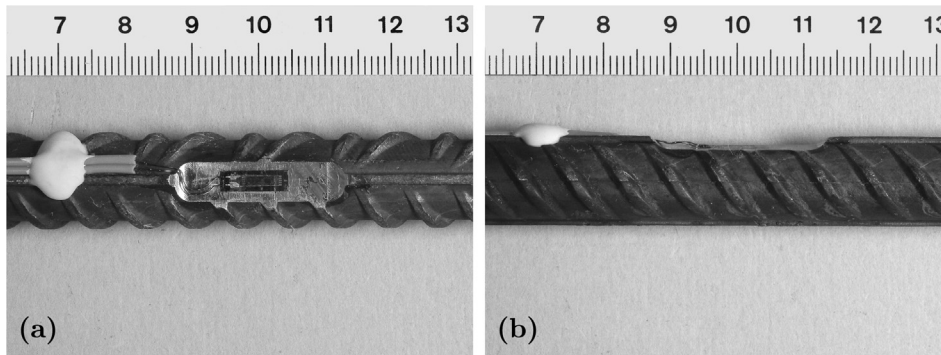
Reinforcing bar instrumented with a strain gauge: (a) plan view; (b) side view.
